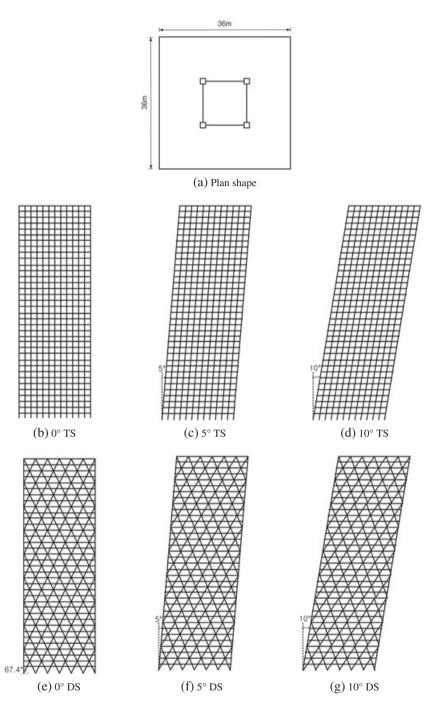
Structural shapes of tubular (TS) and diagrid (DS) structures.
